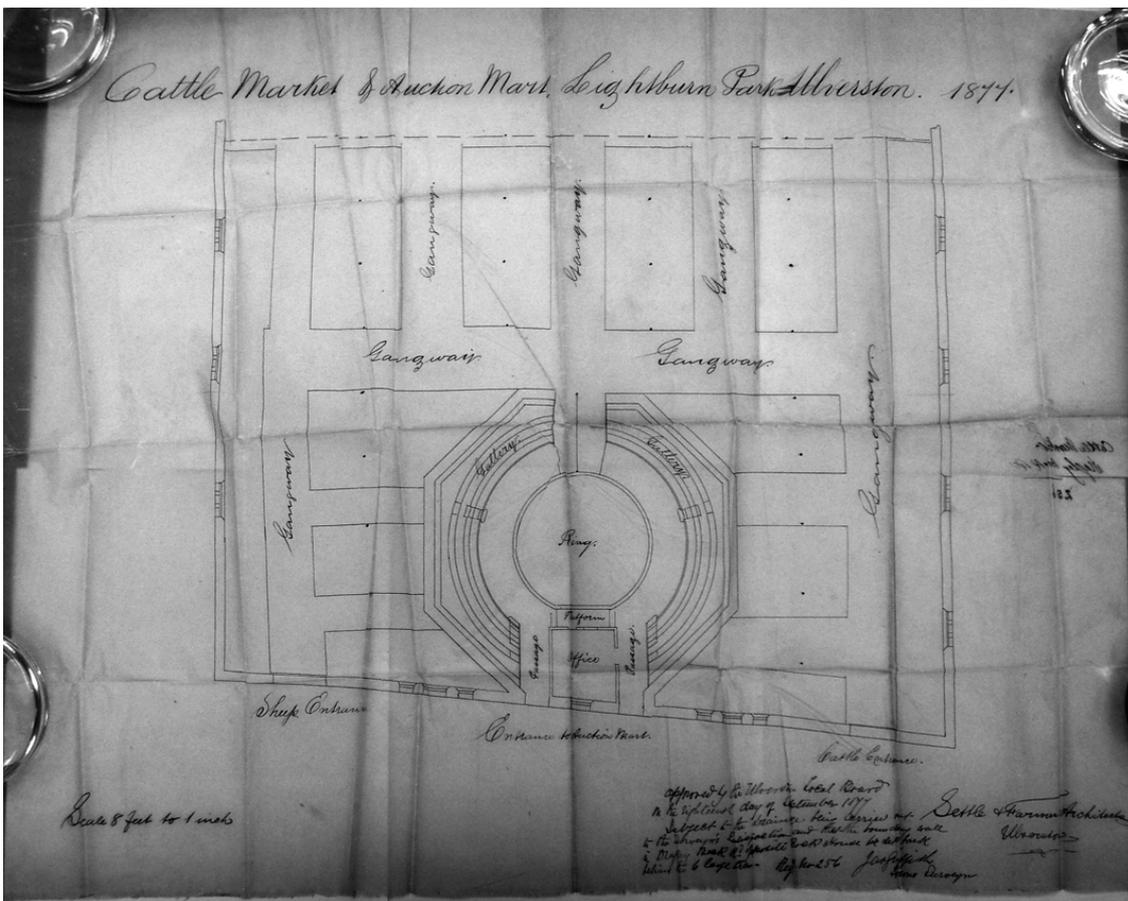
Plan of the Cattle Market and Auction Mart, Lightburn Road, Ulverston, 1877
